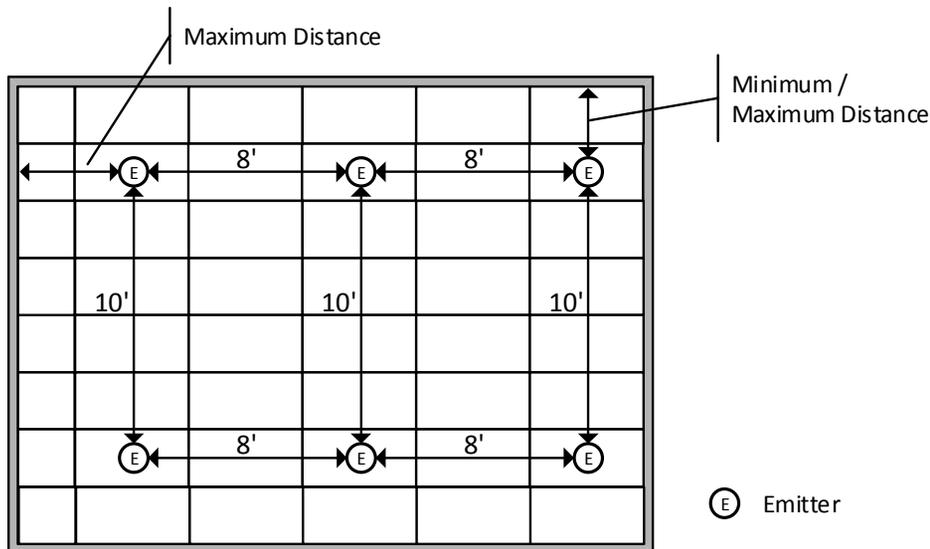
10' x 8' room layout with 2' x 4' ceiling tiles
